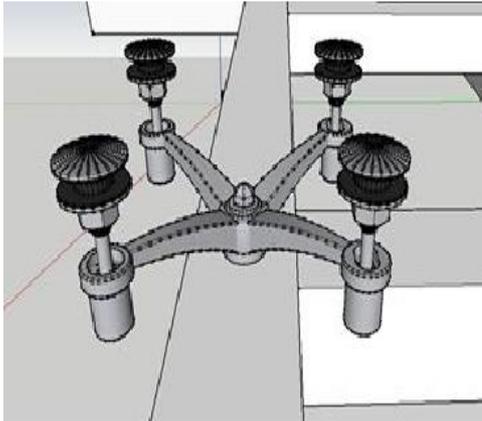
A sample of an augmented steel construction detail, produced by a student (Project 2)
